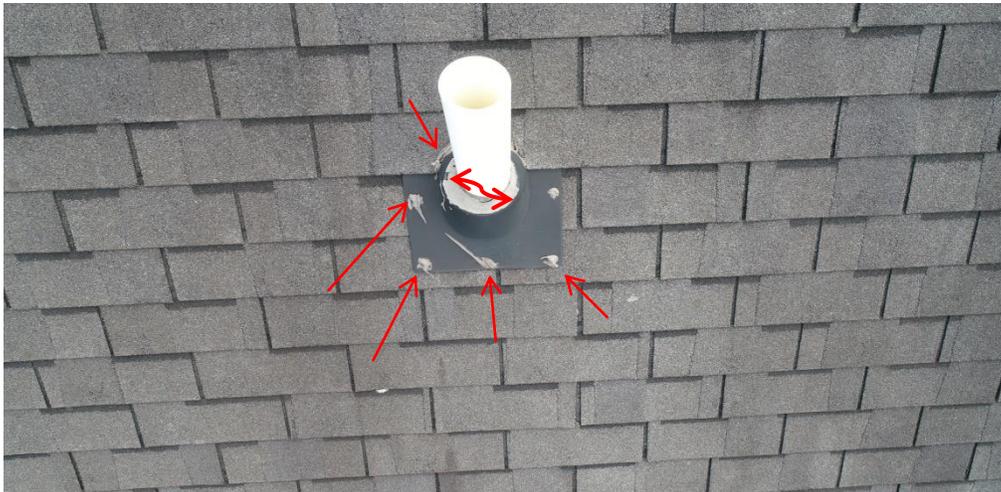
Aerial View of PVC Vent Pipe with Visible Sealant/Caulking Application
